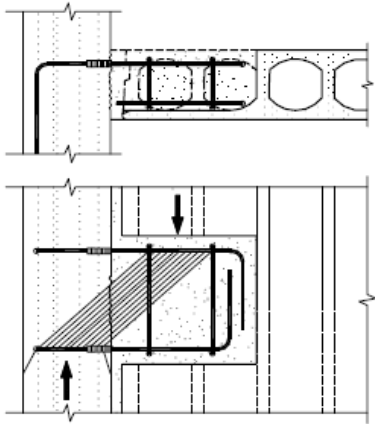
floor-wall shear connection (FIB, 2008, p. 21)
